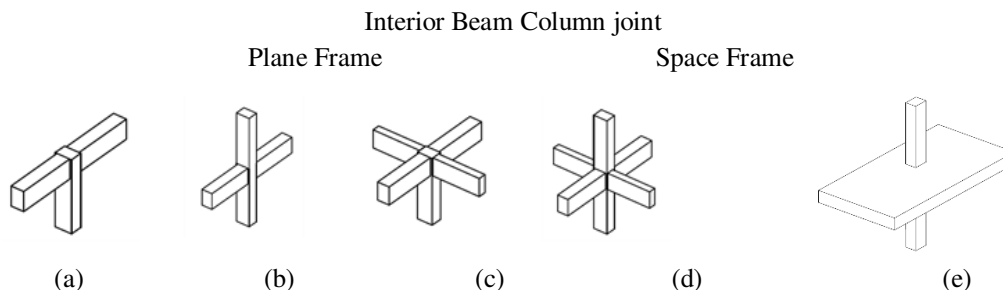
Interior beam-column joint in plane and space frame - (a) Plane frame middle roof joint (b) Plane frame middle floor joint (c) Space frame middle roof joint (d) Space frame middle floor joint. (e) Slab -Beam Joint [9]
